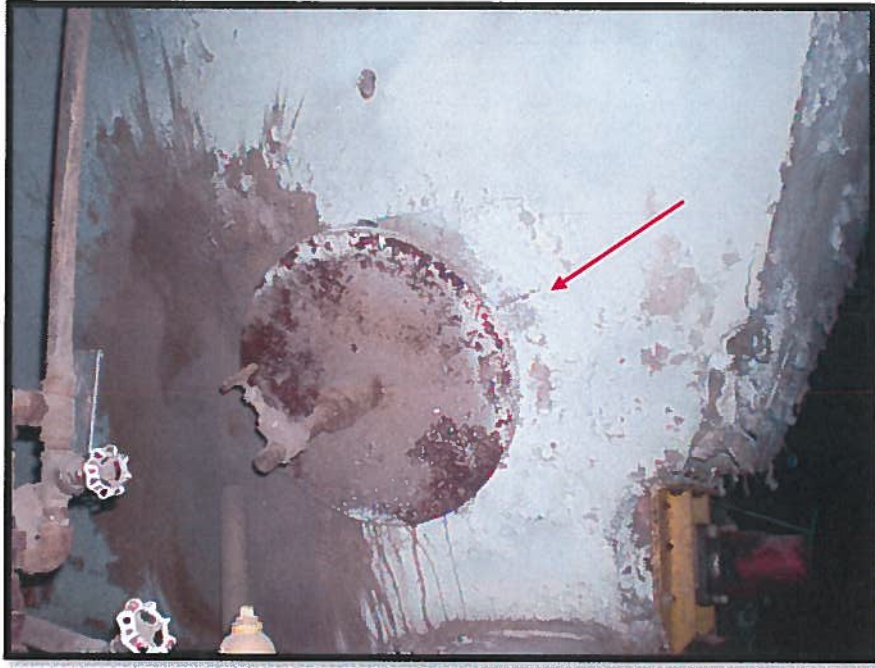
Asbestos-Containing Spray-Applied Wall Insulation, West Wall (Sample 08).
